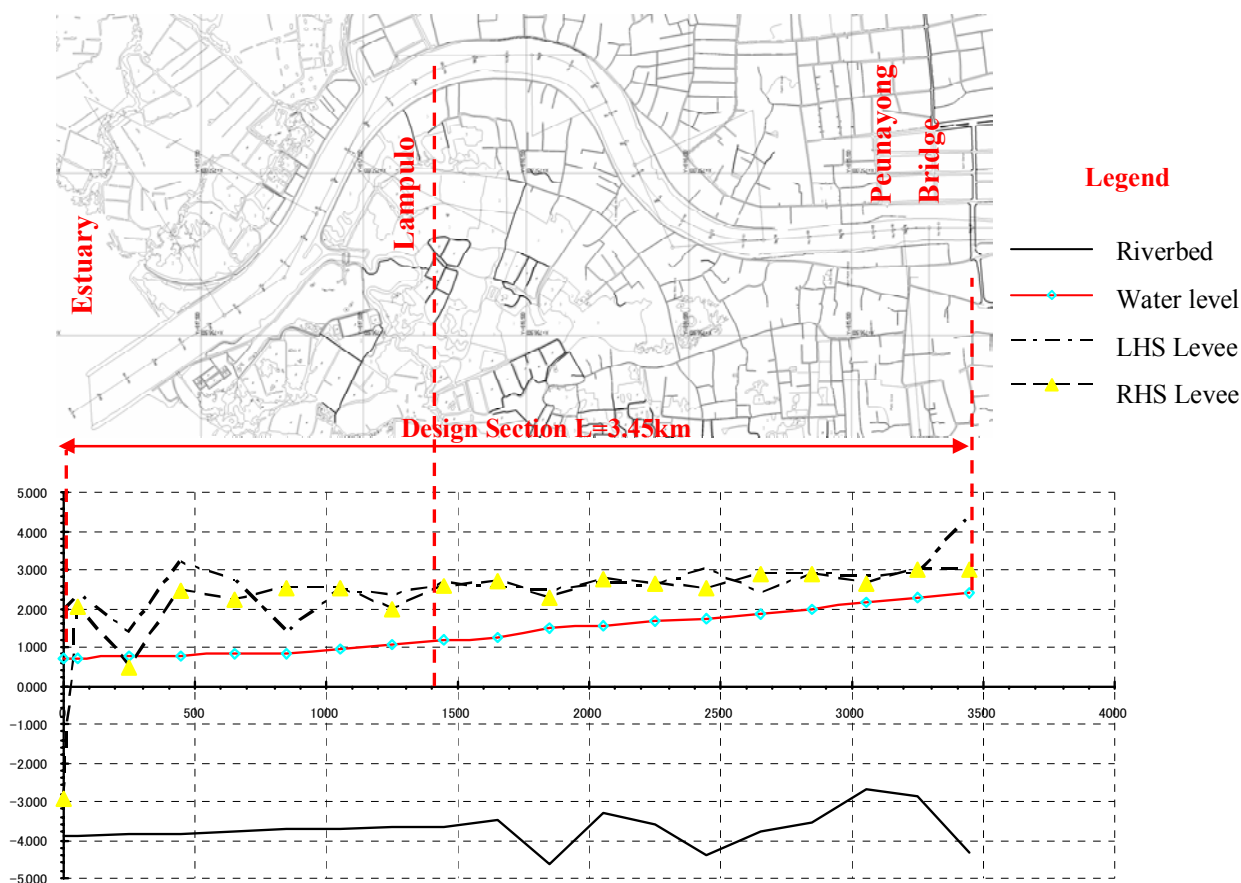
Plan and Profile of Aceh River: Hydraulic Design Case 2
